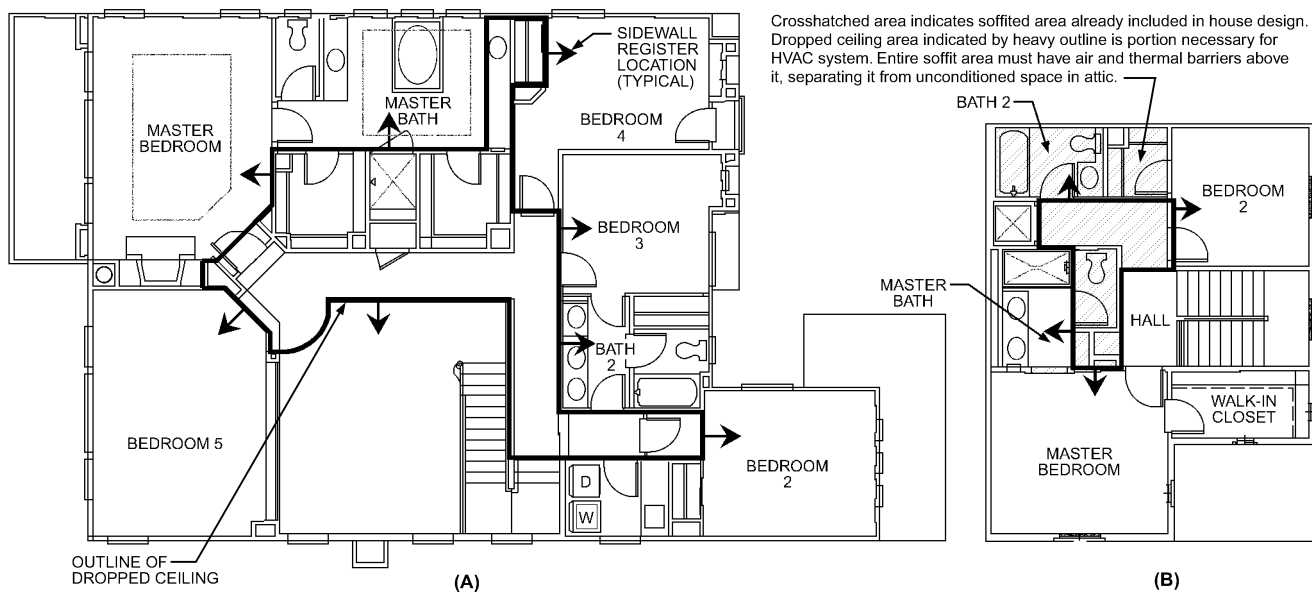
Sample Floor Plans for Locating Ductwork in Second Floor of (A) Two-Story House and (B) Townhouse
